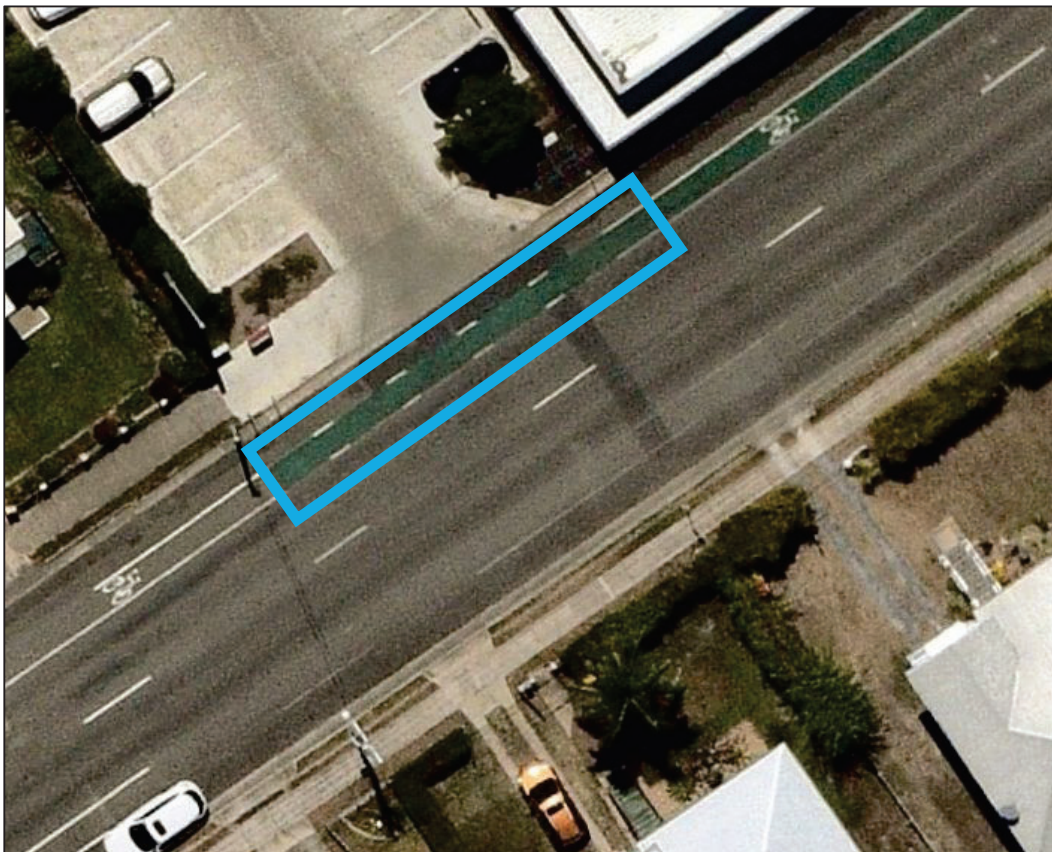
Recommended Green pavement imprint treatment for the cycleway section across the driveway
